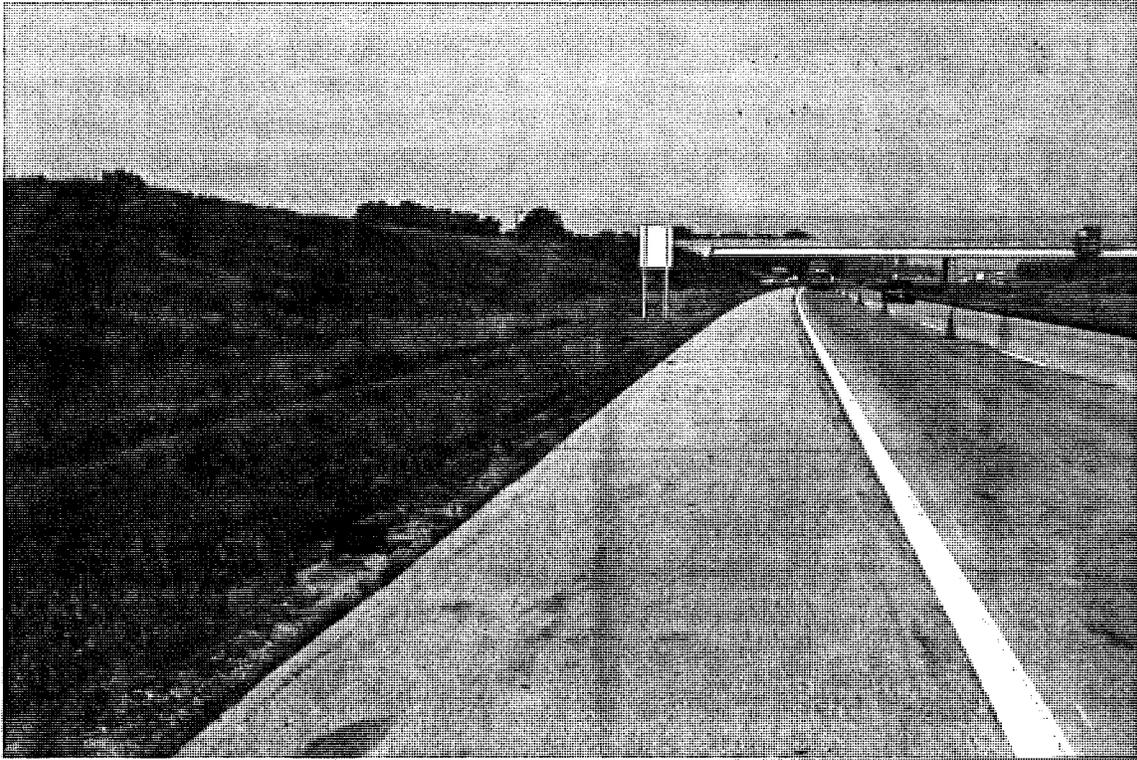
An overview of CSN# 19042-24680A (Section B) EB looking west. This section has 41 ft slabs and concrete shoulders with no intermediate joints.
